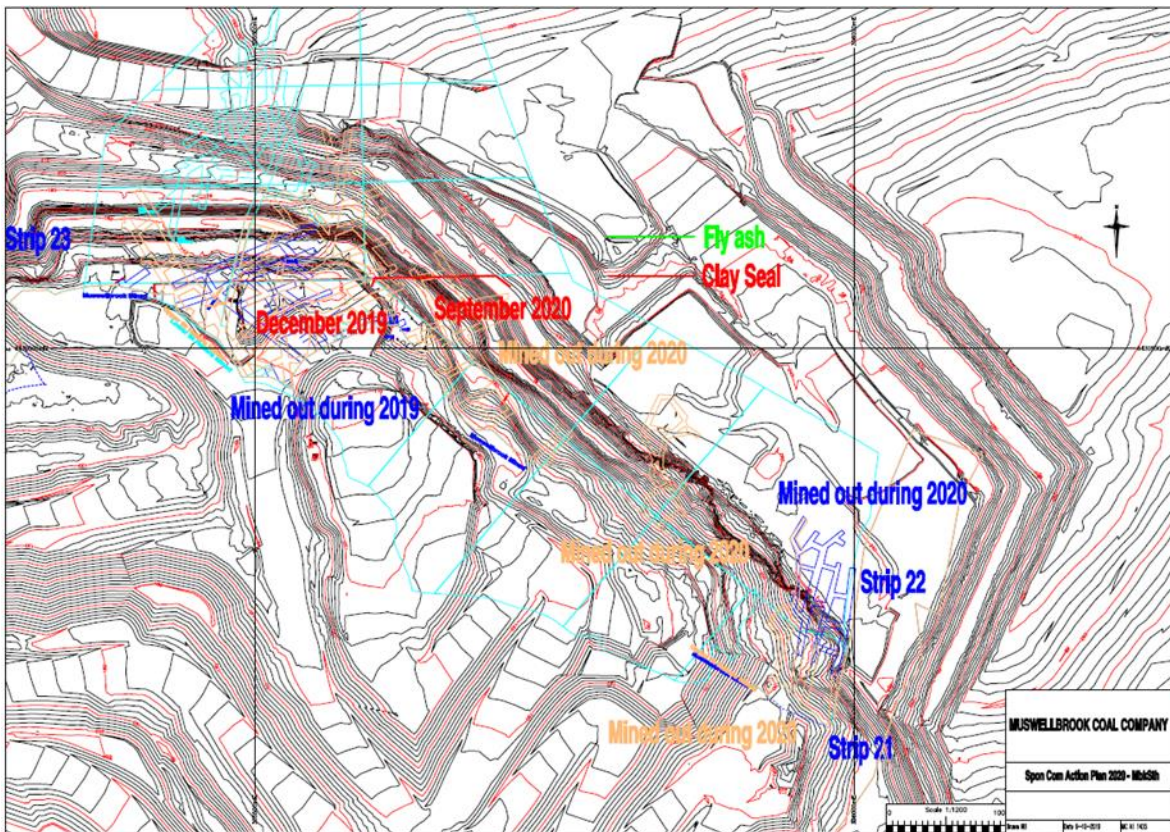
Proposed sealing in Muswellbrook and St Heliers Workings
